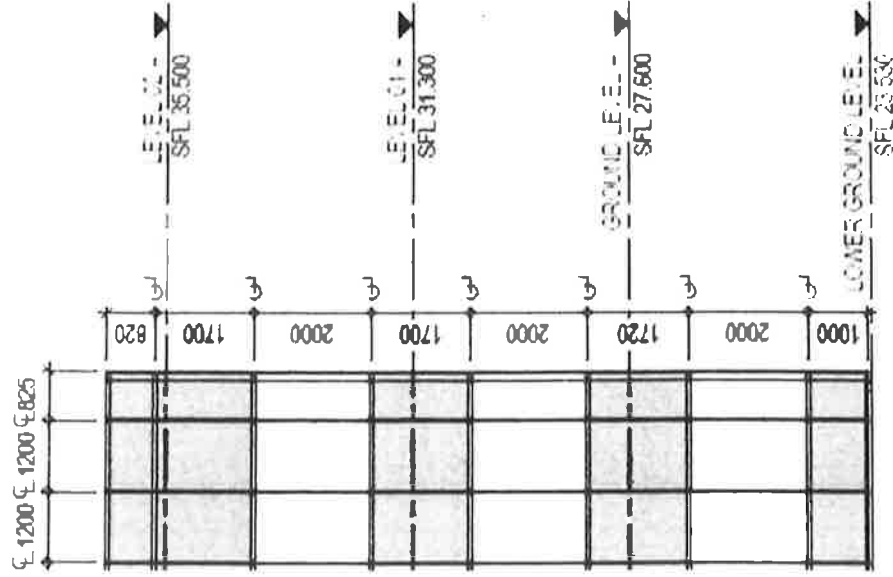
and 02: Elevations showing the retail, podium and link bridge
